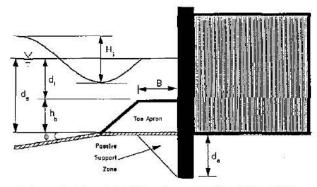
Typical Toe Apron for Sheet-Pile Walls
